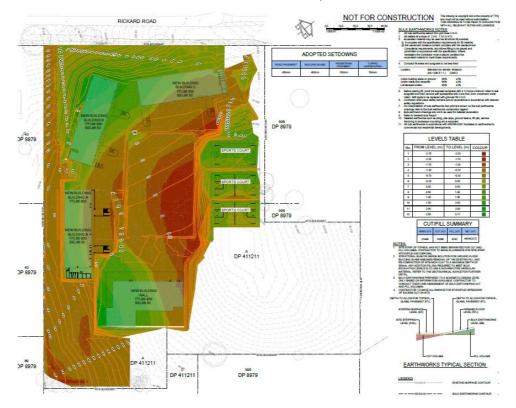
Earthworks - cut and fill volumes plan (Source: TTW)
